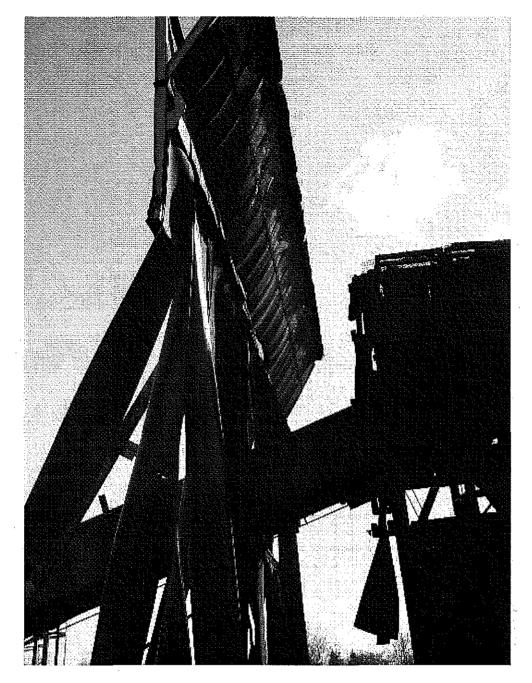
(Photo 3) : Vertical mat, used for noise reduction.
